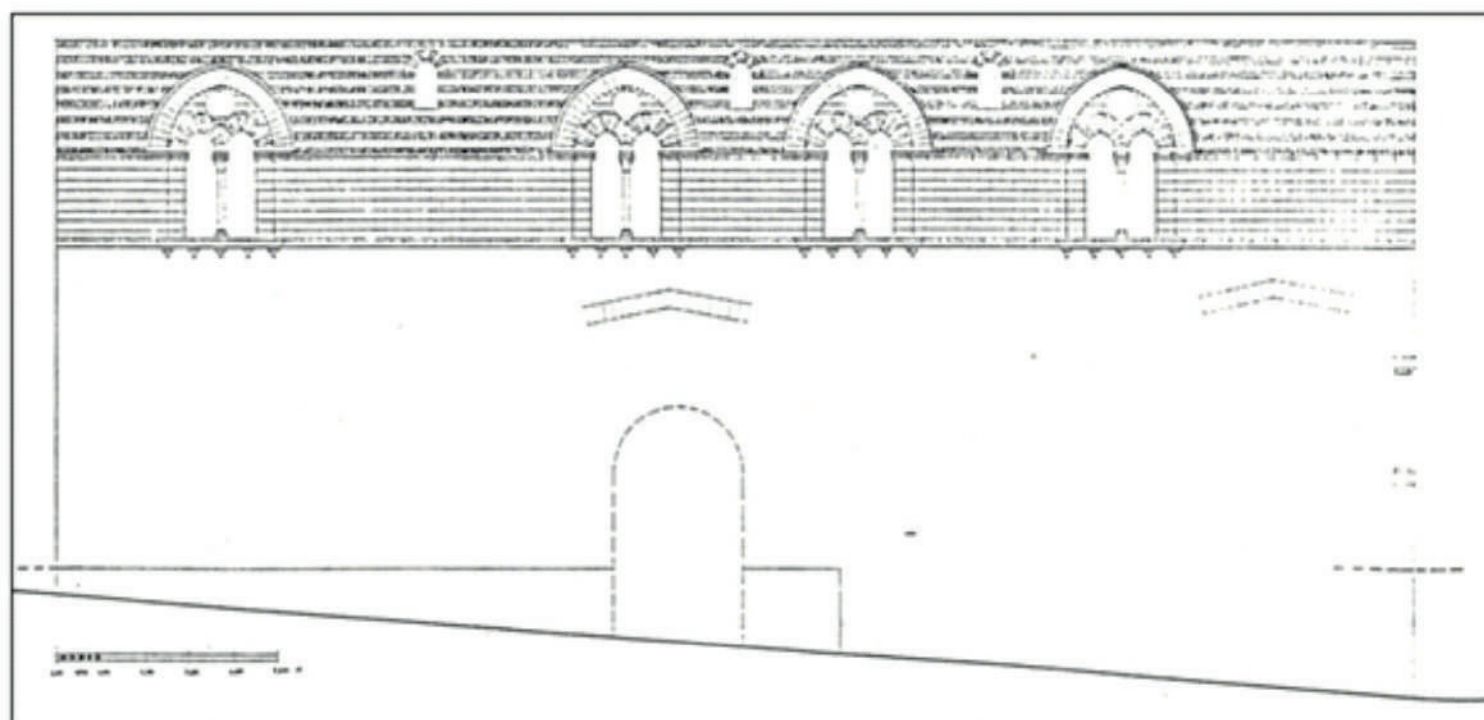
Galletti di Santamarina Palace, facade portion along Celso Street. Reconstruction hypothesis of the former façade. © Spatrisano 1972
